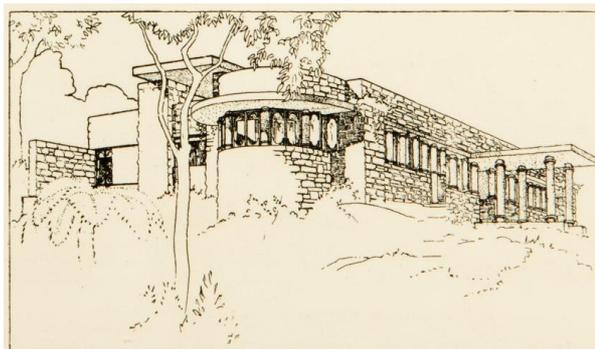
Perspective of Griffin's original design for the Rivett House with flat roof and stone walls. Source: Castlecrag Homes, GSDA, c1928. Caroline Simpson Collection.
